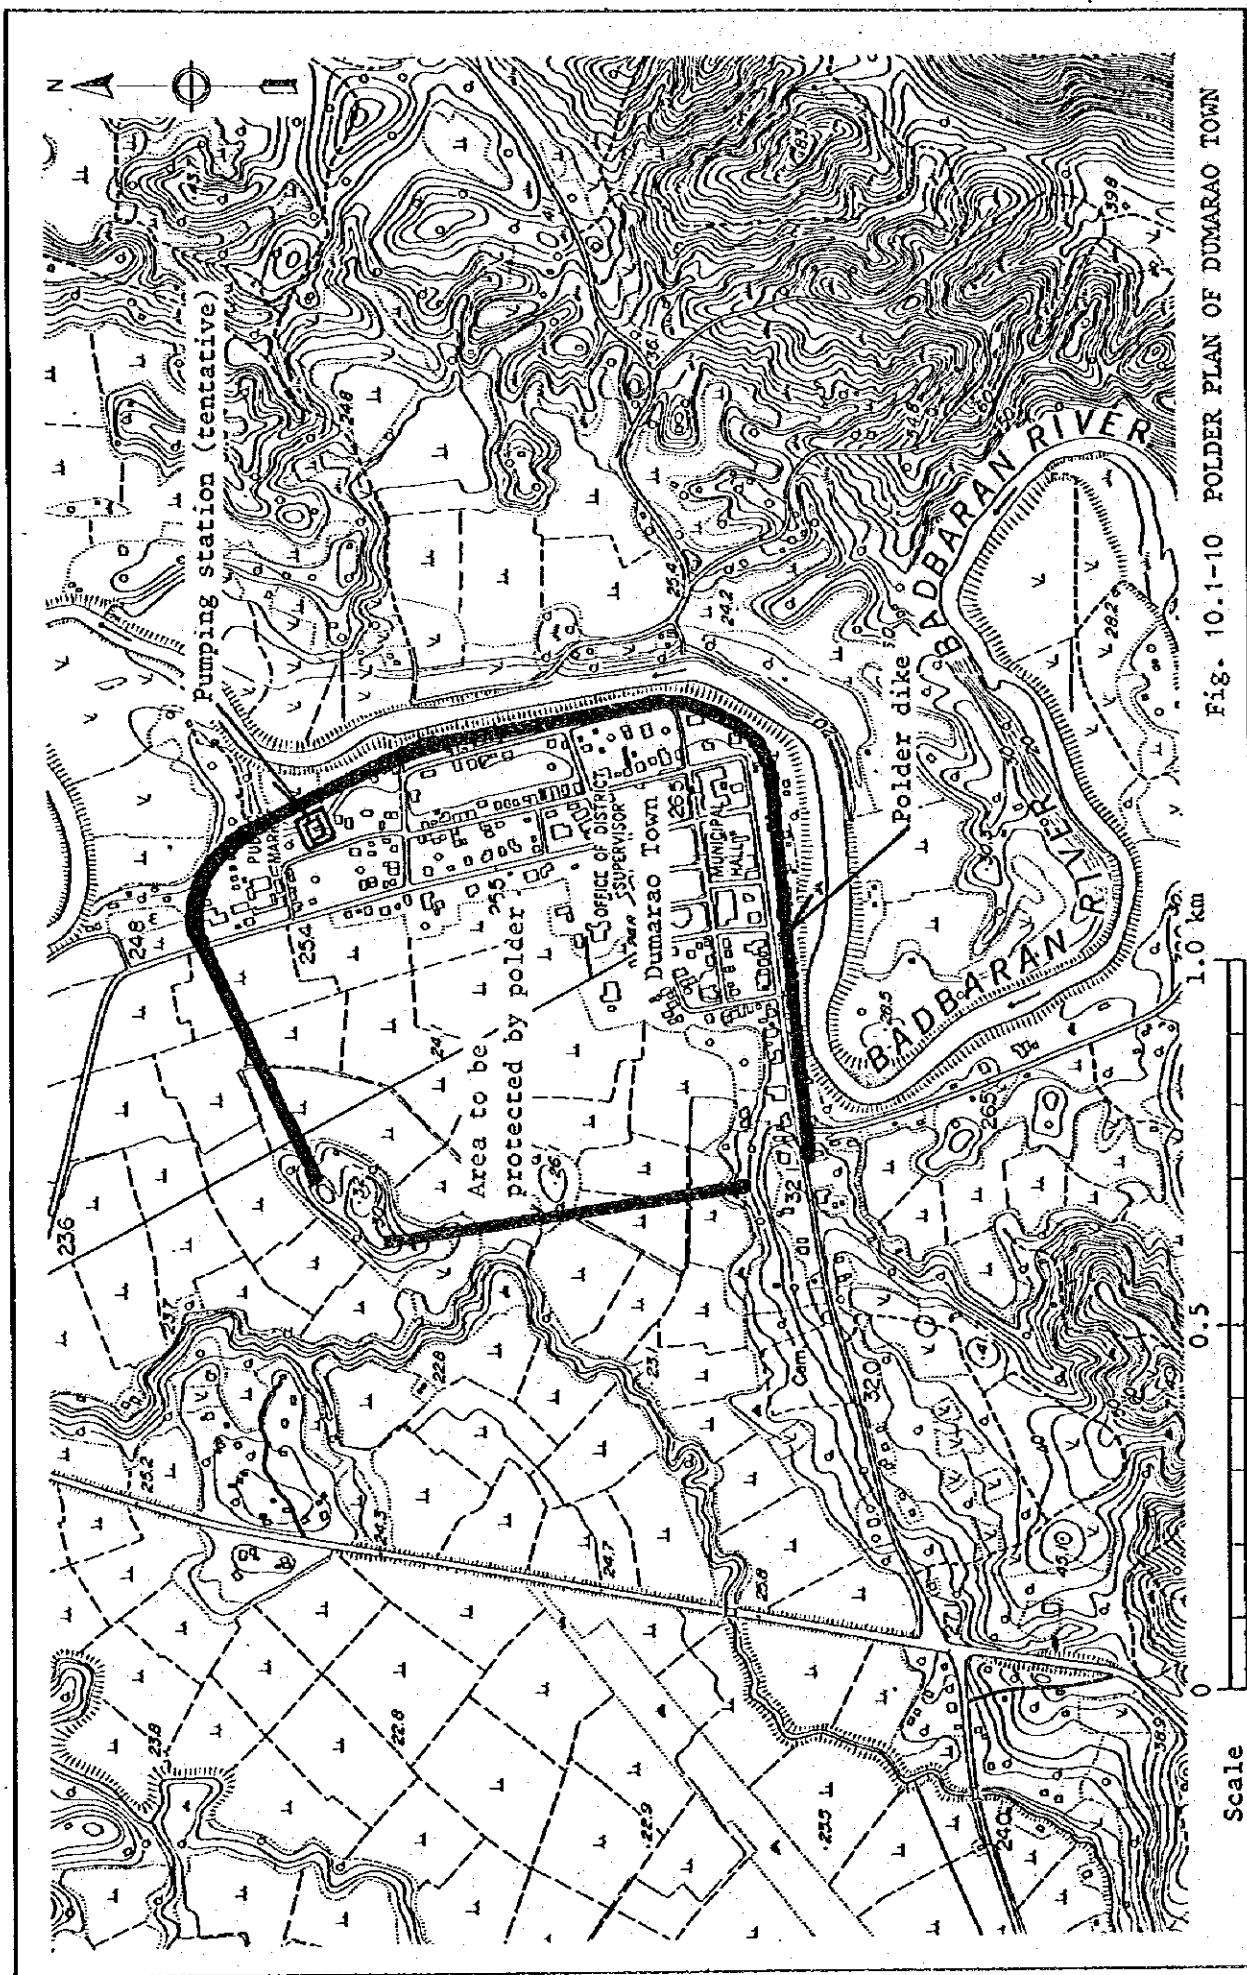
POLDER PLAN OF DUMARAO TOWN
